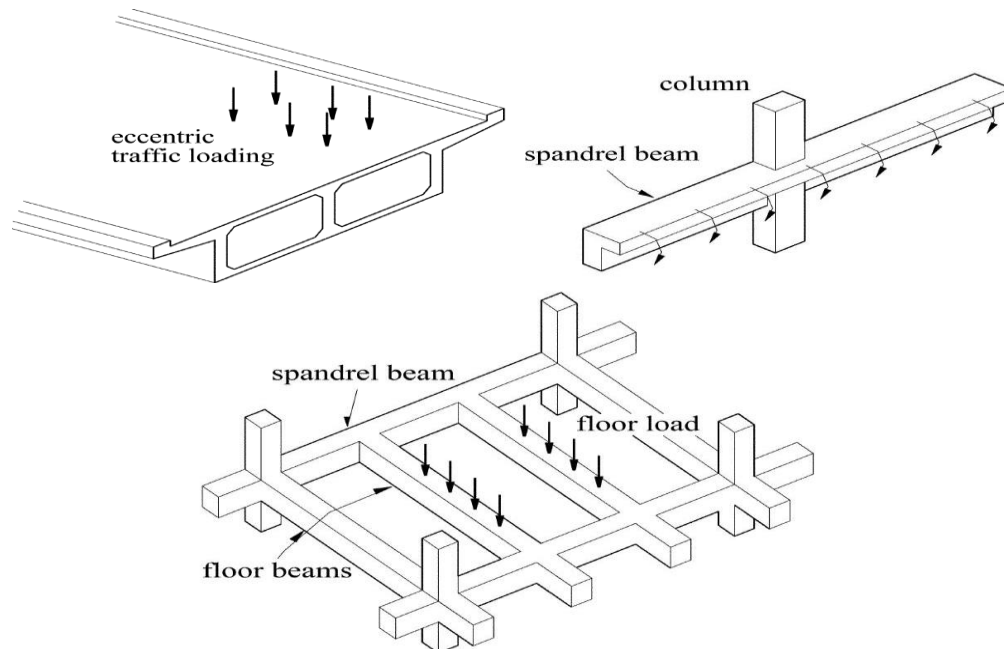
Examples of torsion load in reinforced concrete members. [1]
